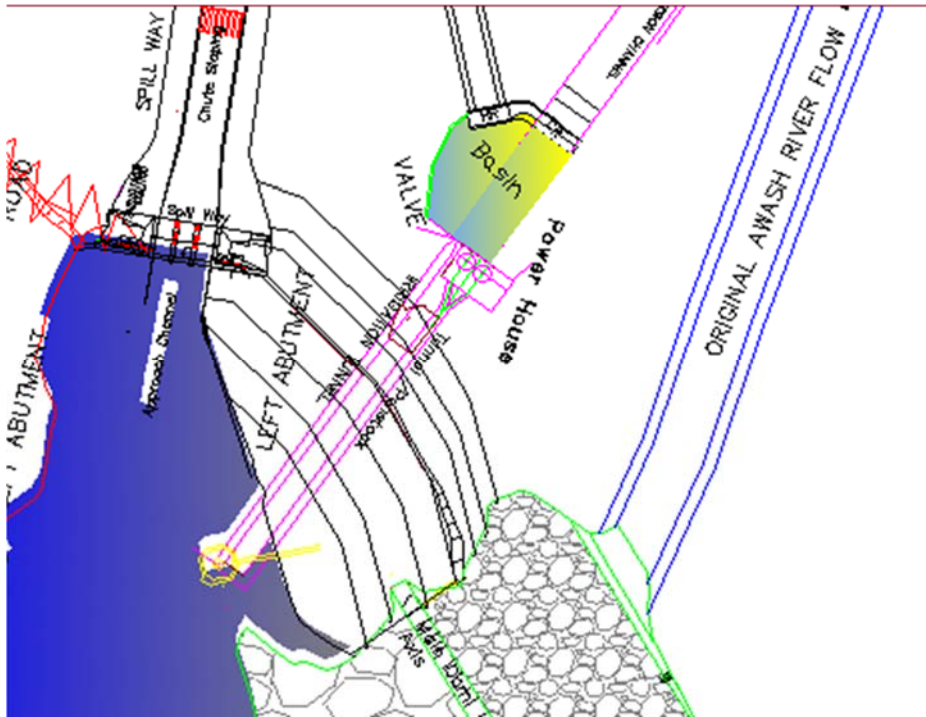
a-Option I Layout arrangement of Independent proposed tunnel/penstock and Location of Power House
